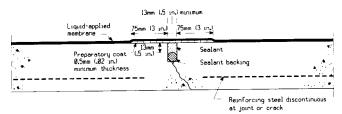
Treatment of Nonreinforced Cracks and Joints (see 10.4.4.2 and 14.5.3)
